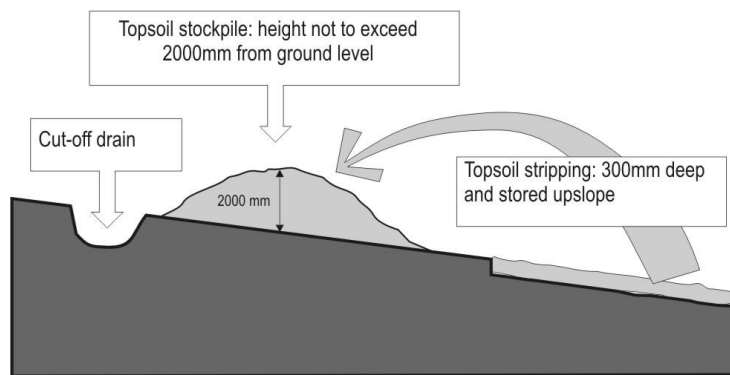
Section through a typical topsoil stripping and stockpiling operation
